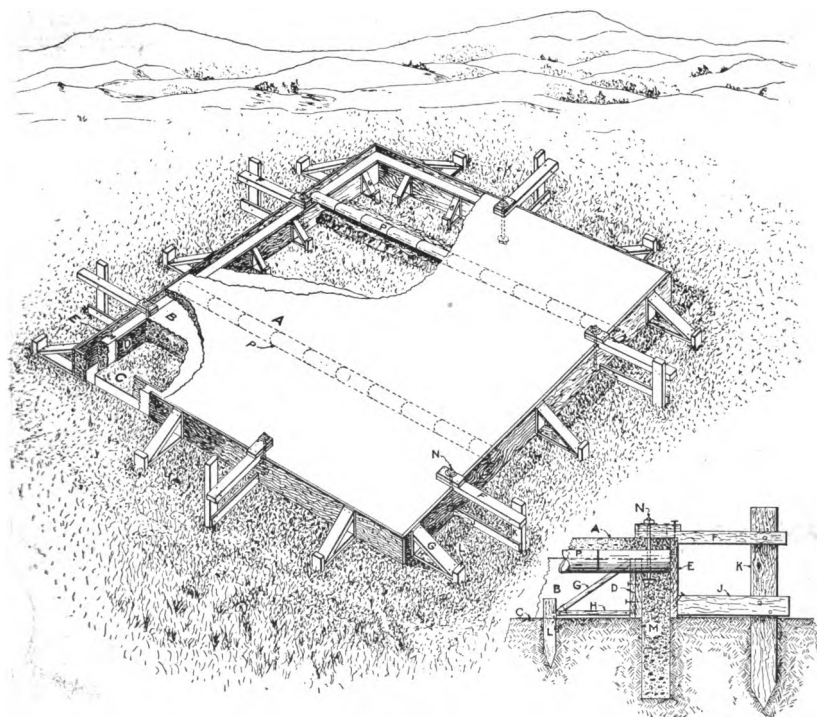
This illustrates the method of building the forms for a concrete foundation and floor. Two layers of tile (P) extend through the foundation and under the floor from side to side. That keeps the floor dry. The larger illustration shows a part of the floor and foundation cut away so that each part may be plainly seen. The illustration in the lower right hand corner shows the detail method of construction of the forms for holding the concrete in place.
